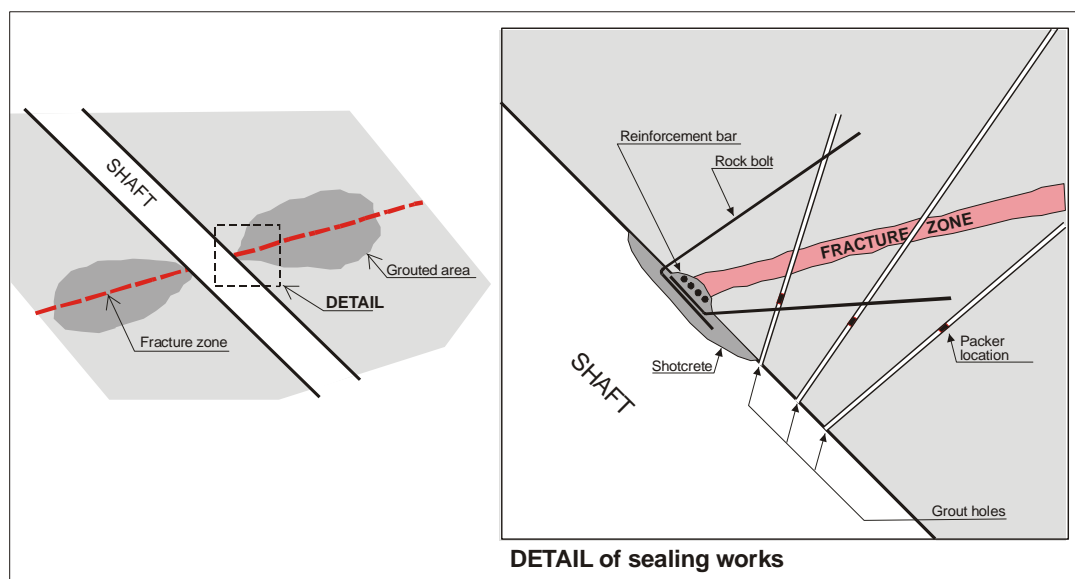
Rock support and sealing of a fracture zone in a shaft.
